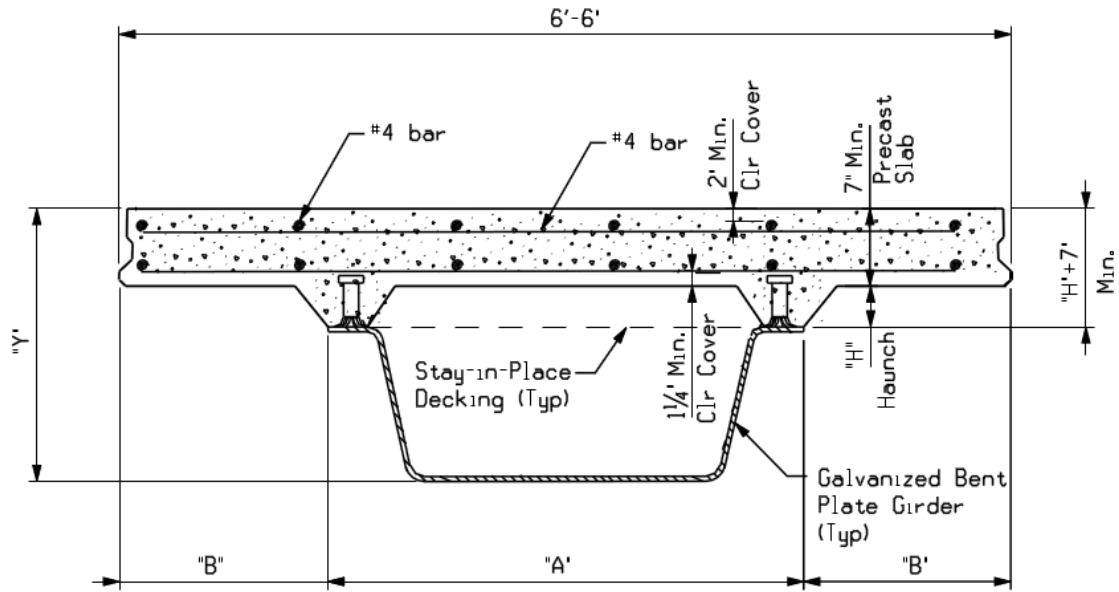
Con-Struct Bridge System (Tricon Precast, 2008)
